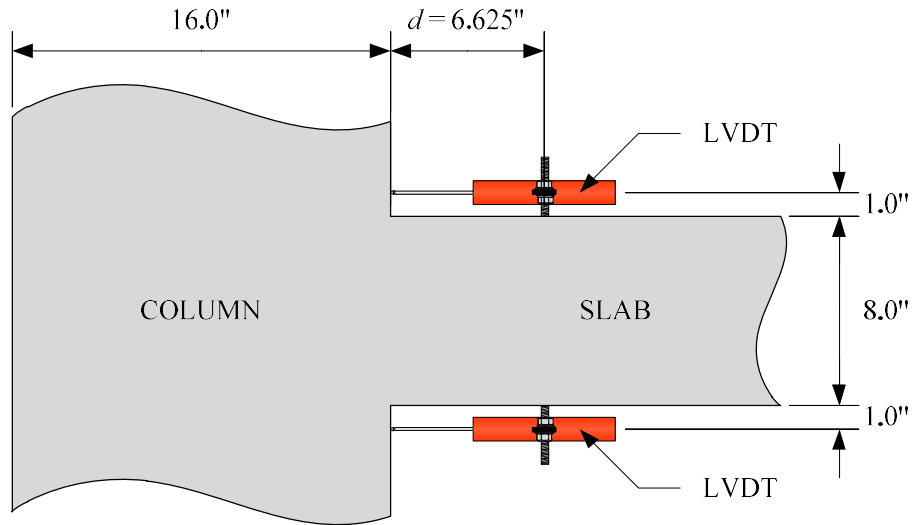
Typical LVDT Layout for Specimens G1 and G2
